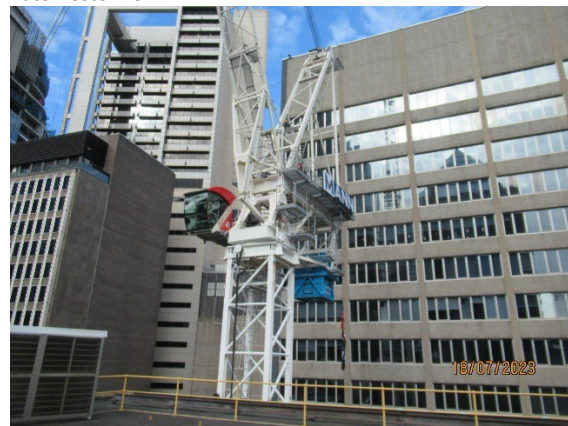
Hunter Street West: Tower Crane (electric) installed.
